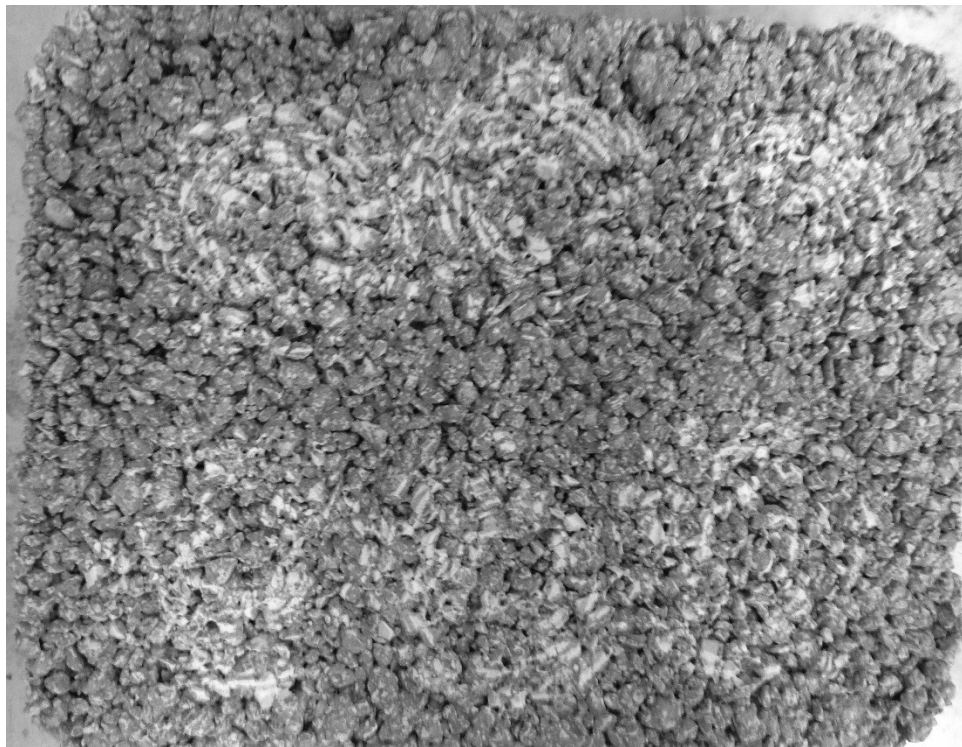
Abrasion Plate Specimen After Rotary Abrasion Testing
